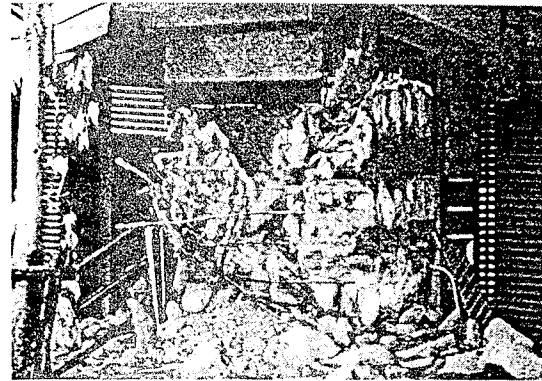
Damage of the first floor column of the high-rise multiple dwelling house (Tunshih, Taichung County)
